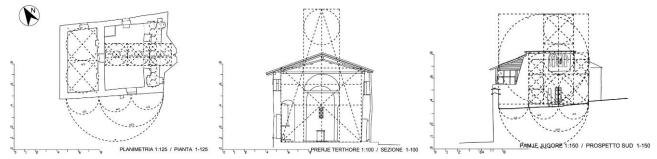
Geometrical-proportional study in plan, section and elevation according to the "harmonic section"
